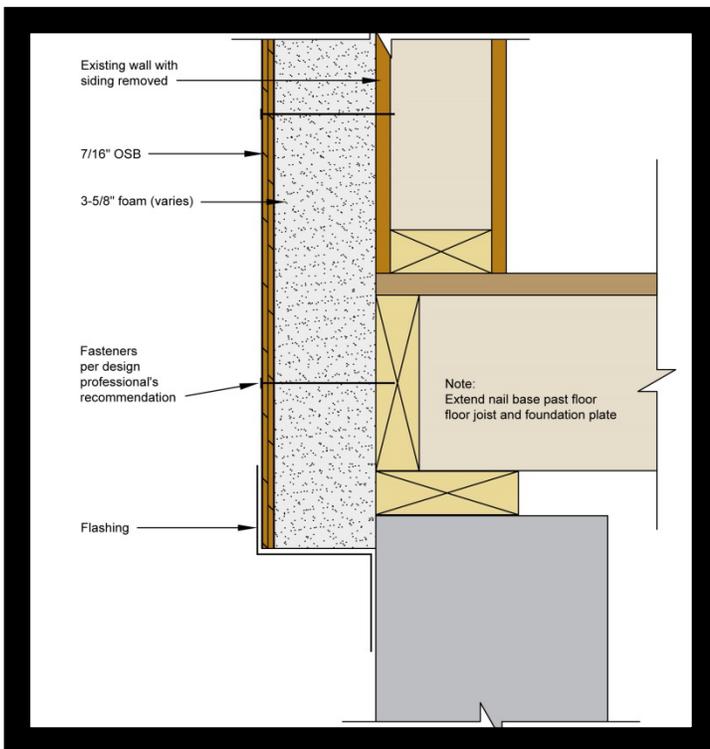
Retrofit Insulated Panel Extended Over Rim Joist
